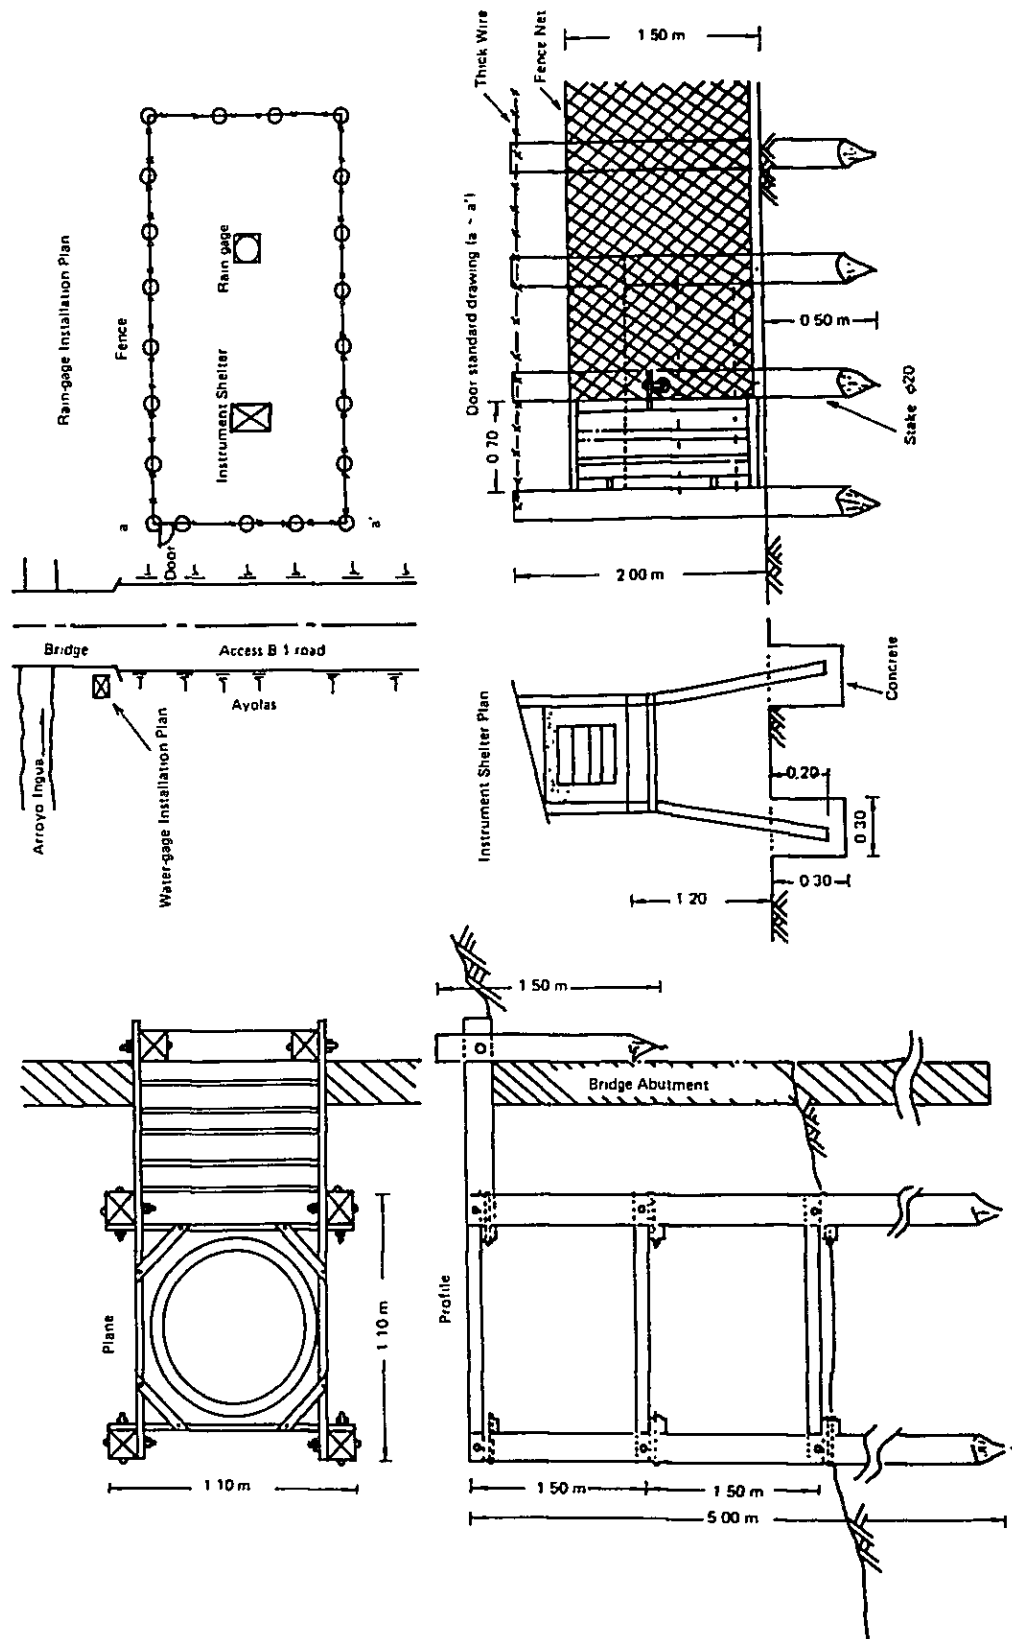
Installation of Water Gage at the Inguá River
